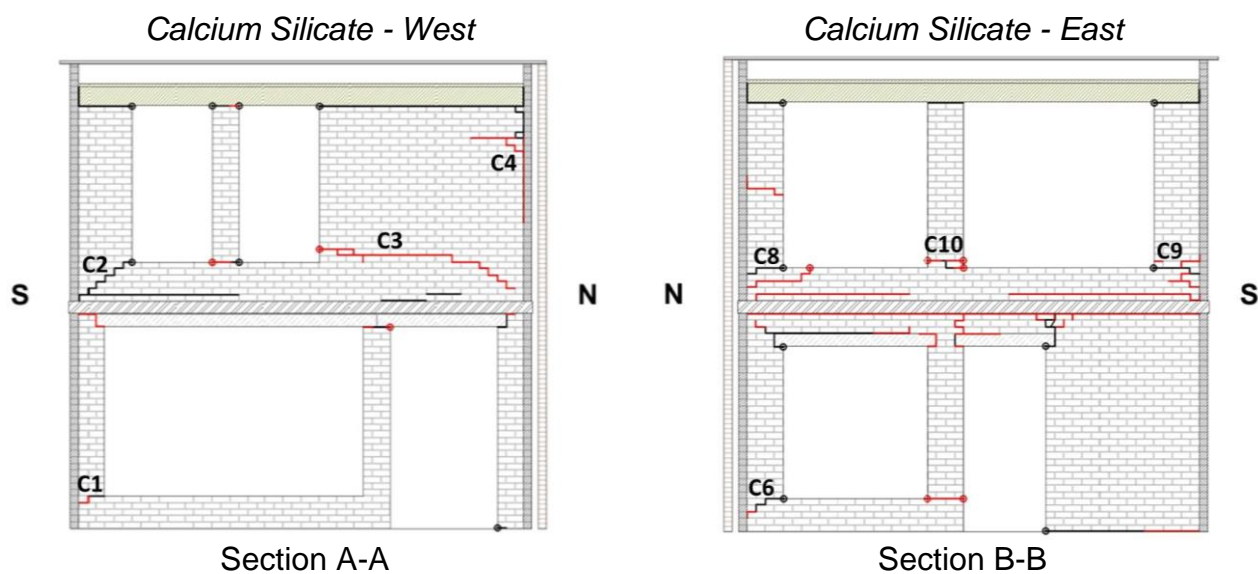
EQ-NPR 85% cracks - Calcium silicate longitudinal walls.
